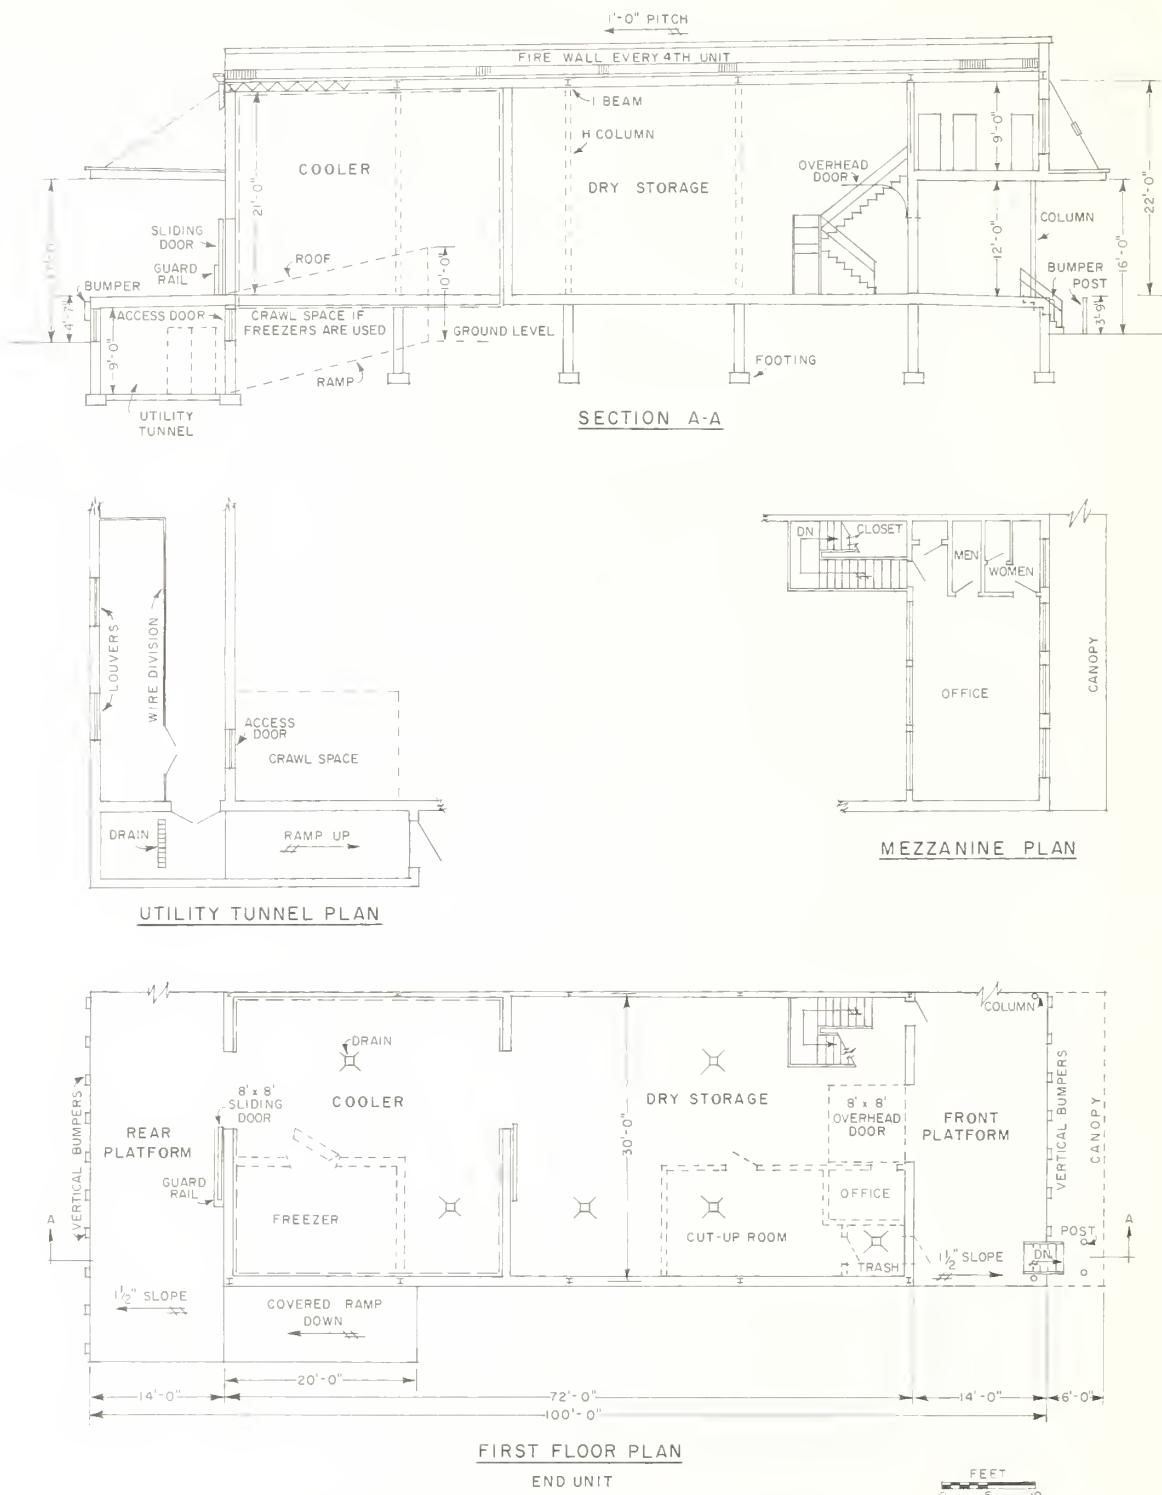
Layout of a poultry unit in a multiple-occupancy building. Notes: 1. The use of a utility tunnel is optional. Without the tunnel, refrigeration equipment could be located on the roof and utility lines inside the building. 2. Buildings shown have support columns. Recent studies, completed during the writing of this report, indicate there would be little or no increase in cost to construct this building without support columns.
